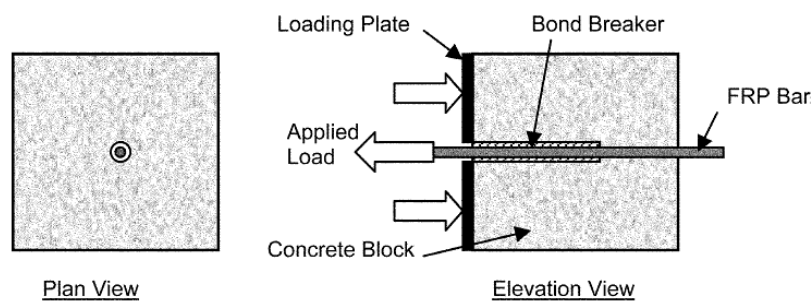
Pullout test specimen. (Source: ACI 440R-07)
